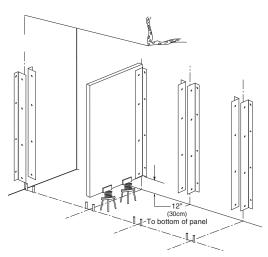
Overhead-Braced or Floor-to-Ceiling Anchored Alcove Closed Layout.
